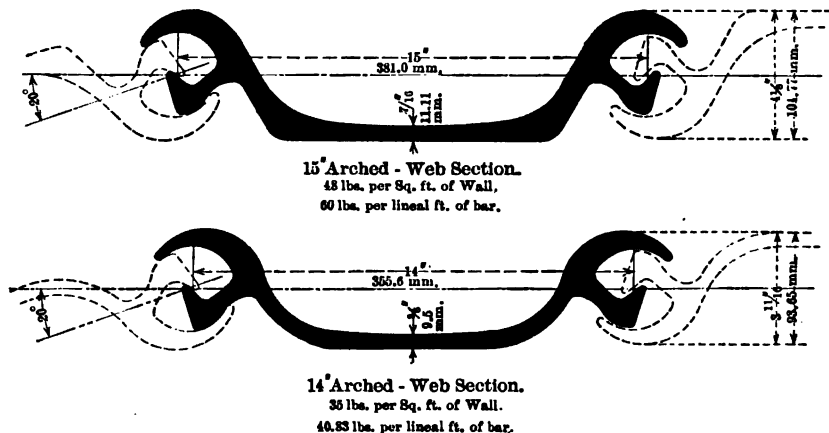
LACKAWANNA STEEL SHEET PILING.
